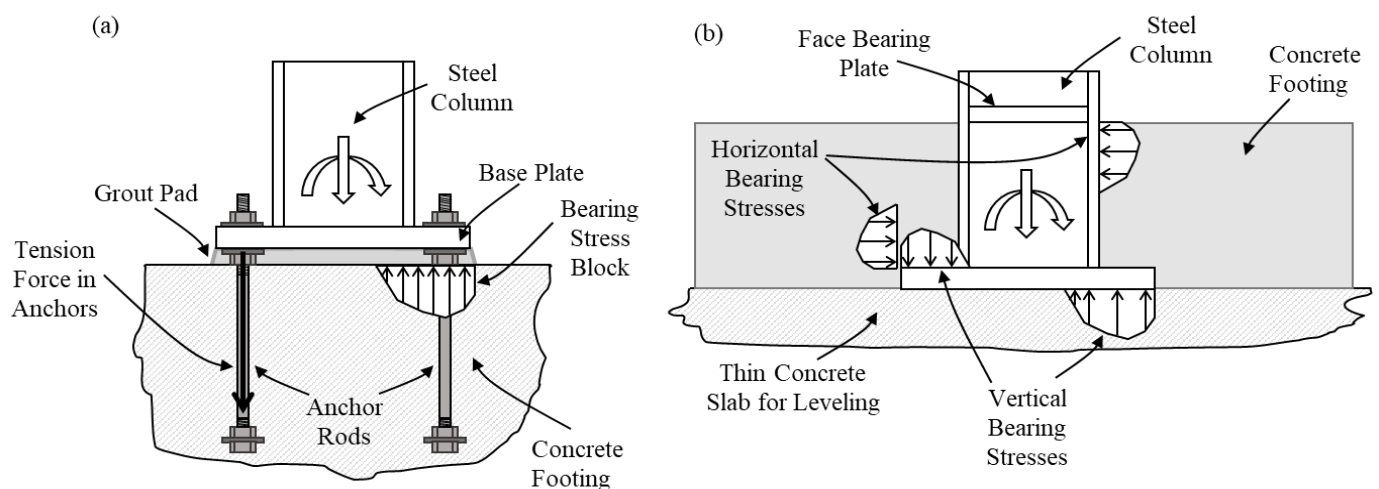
Column base connections and force transfer mechanisms: (a) exposed type; (b) embedded type (ECB Connection)
